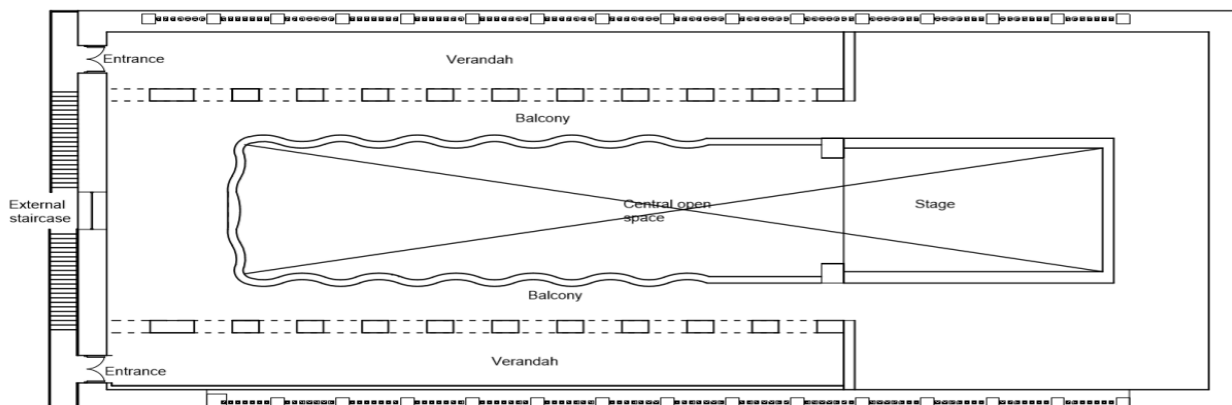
First floor plan of opera house before adaptive reuse -- Source: Author
